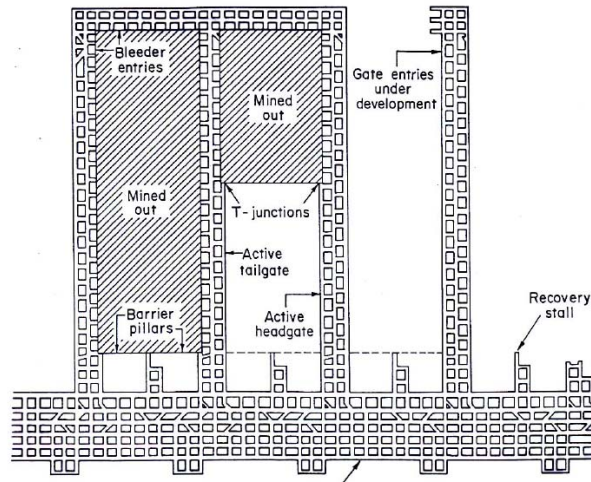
A typical layout of a longwall mine (Mark 2000)
